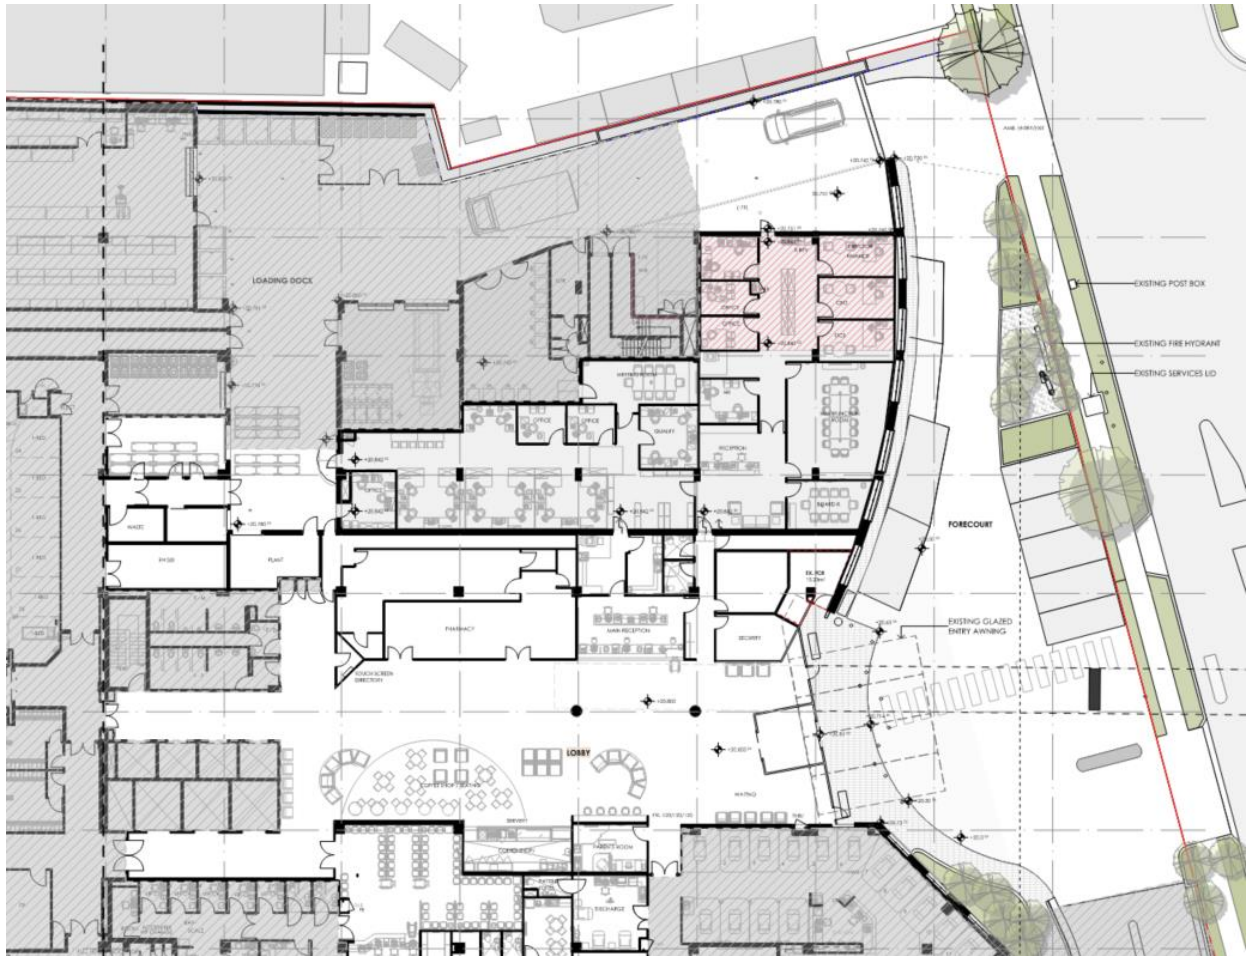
Proposed Floor Plan - Main Hospital Campus
